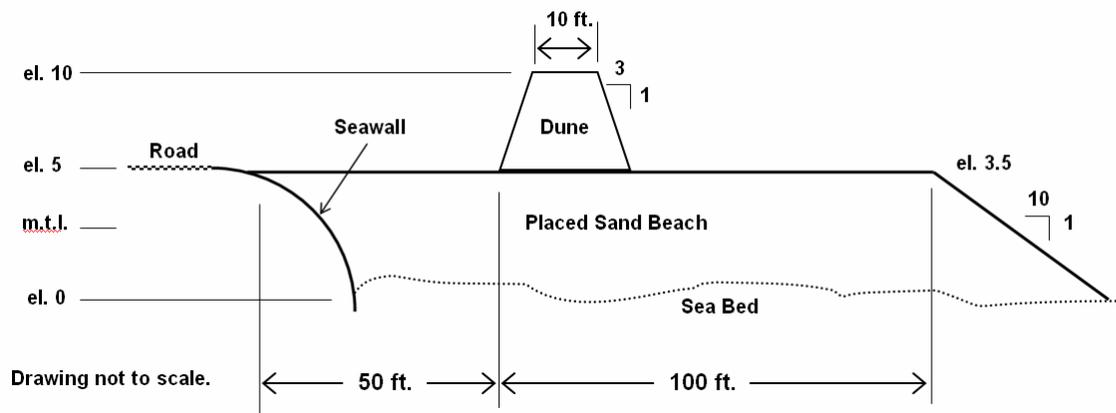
Elevation view, Alternative 3 and Alternative 4 (with dune) beach.
